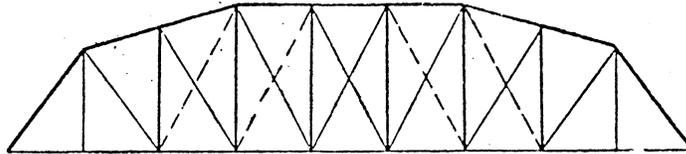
Camelback truss, again a Pratt truss configuration; however, here the polygonal top chord changes slope at alternating panel points. (From Bridge Engineering, James A. L. Waddell, p. 478.)
